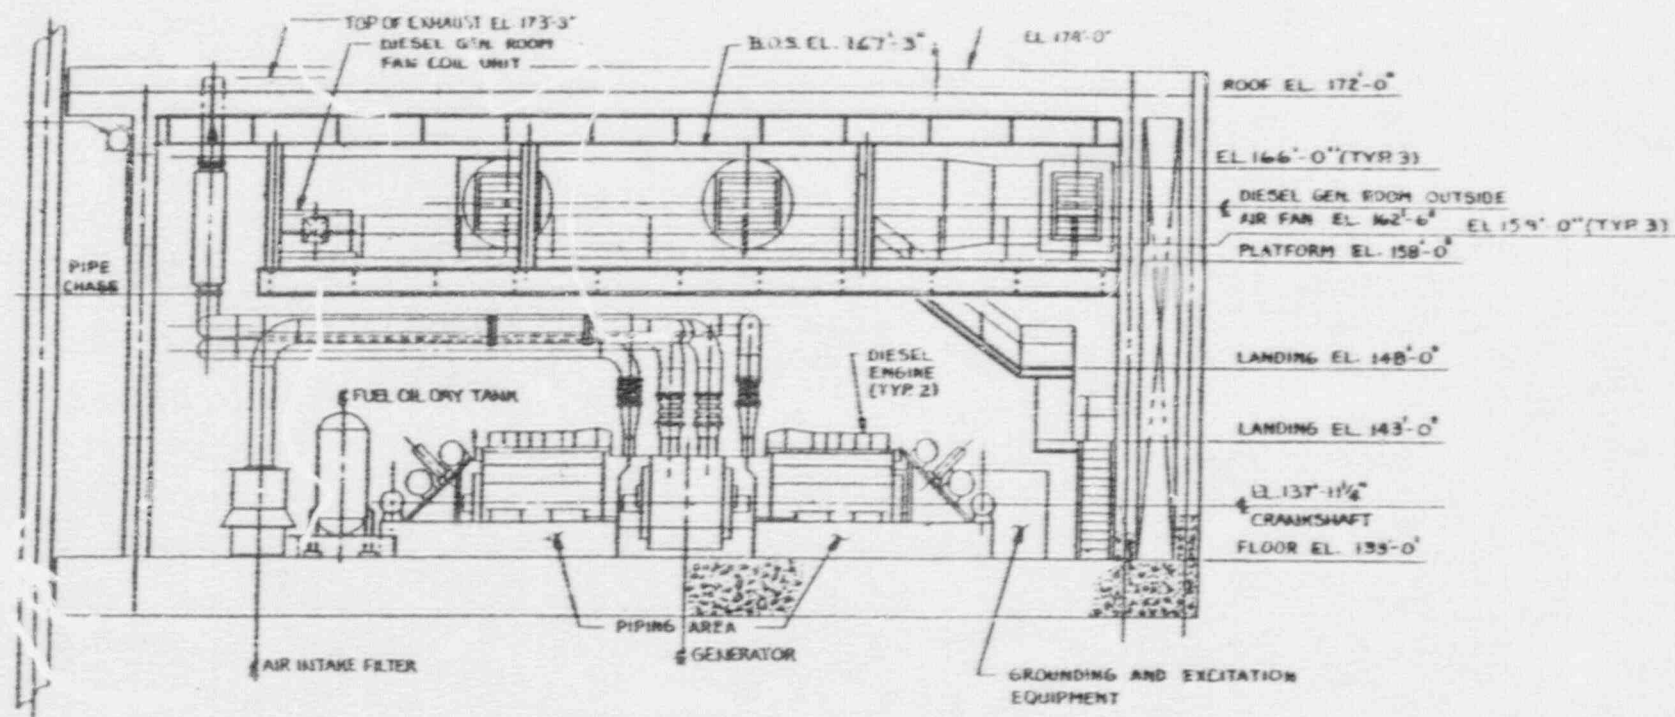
Elevation View of Grand Gulf 1 Diesel Building, Typical of Diesel Rooms A and B (looking south)
